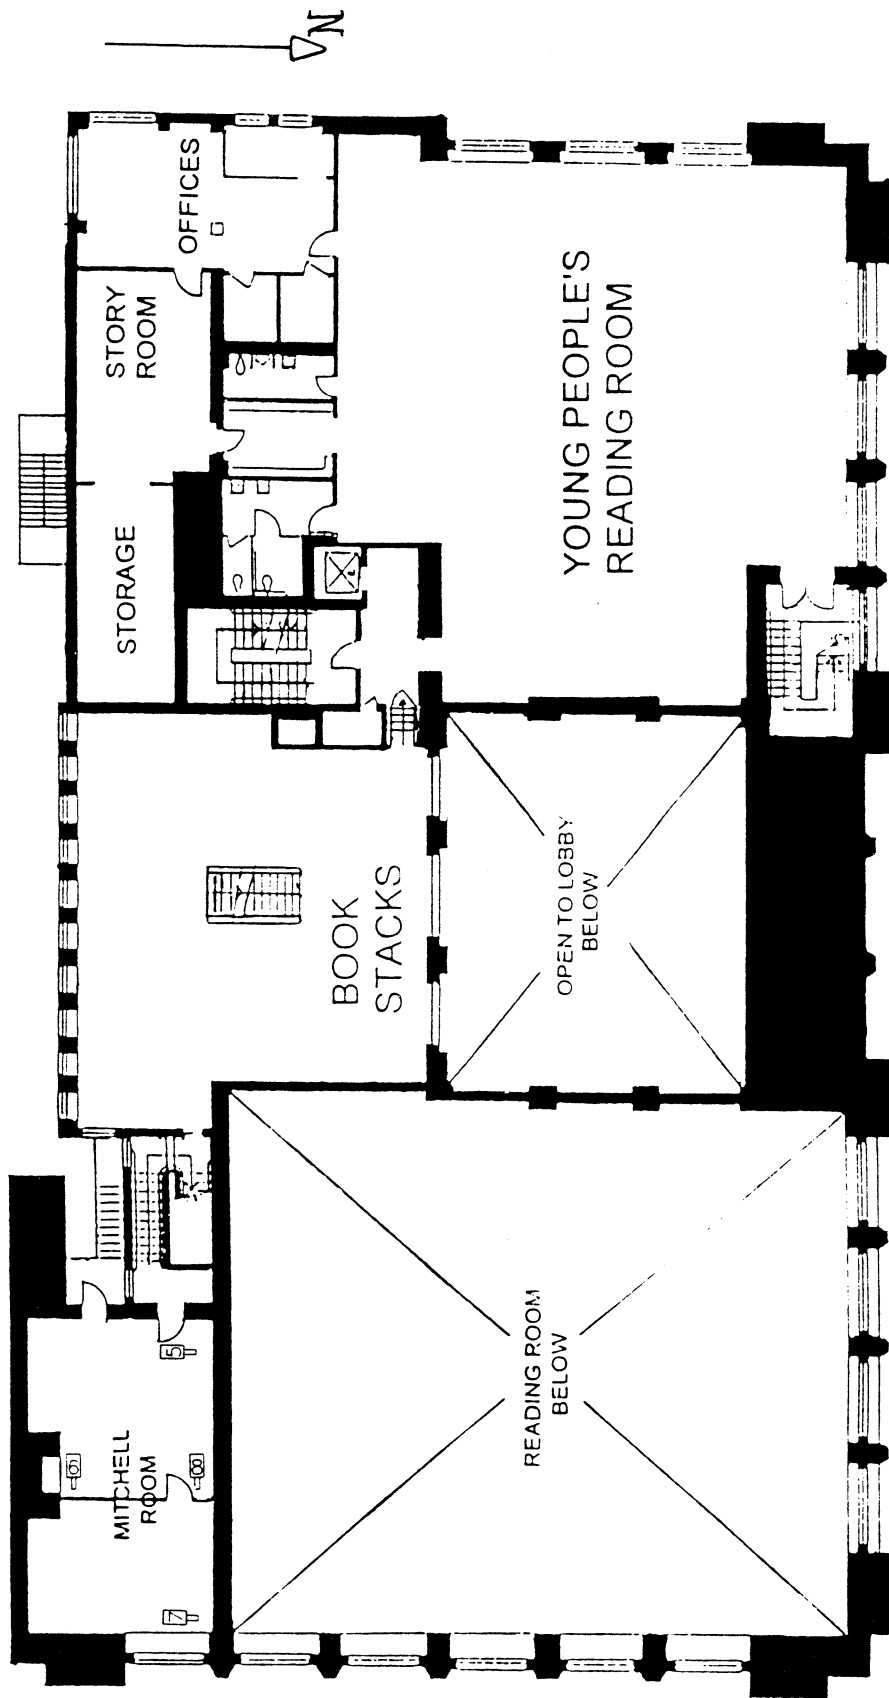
Test No. 8: Mitchell Room Floor Test
